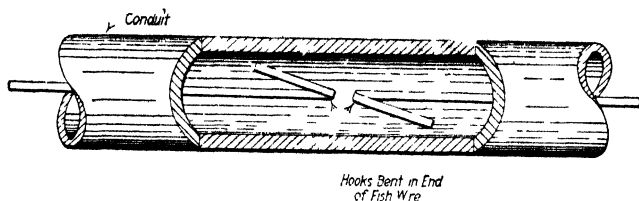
Showing method of bending fish wire ends to insure engagement.
